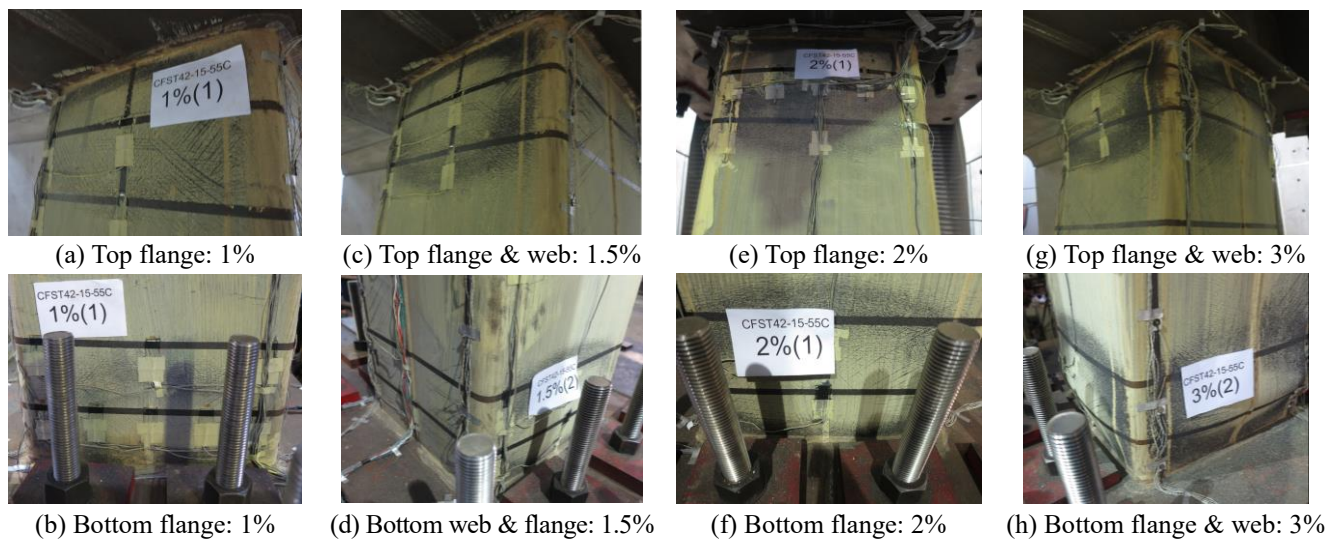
Deformation and failure stages of Specimen CFST42-15/55C
